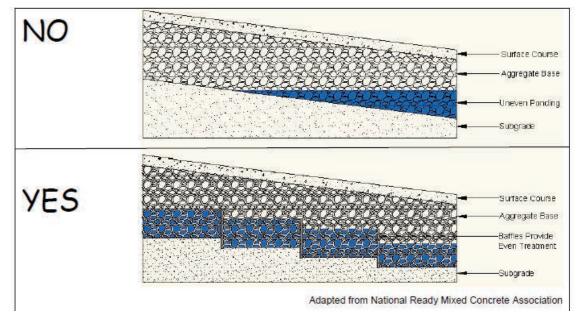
Terraces and baffles under permeable pavement (Source: NCSU-BAE).
